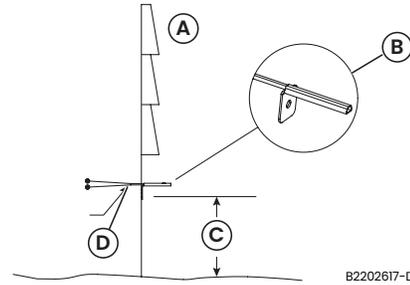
EXTERNAL CONTROL VENTILATION INSTALLATION
